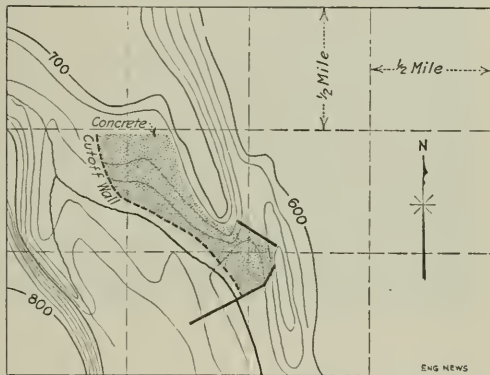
SKETCH SHOWING APPROXIMATE LOCATION OF DAM AND CONCRETE APRON
